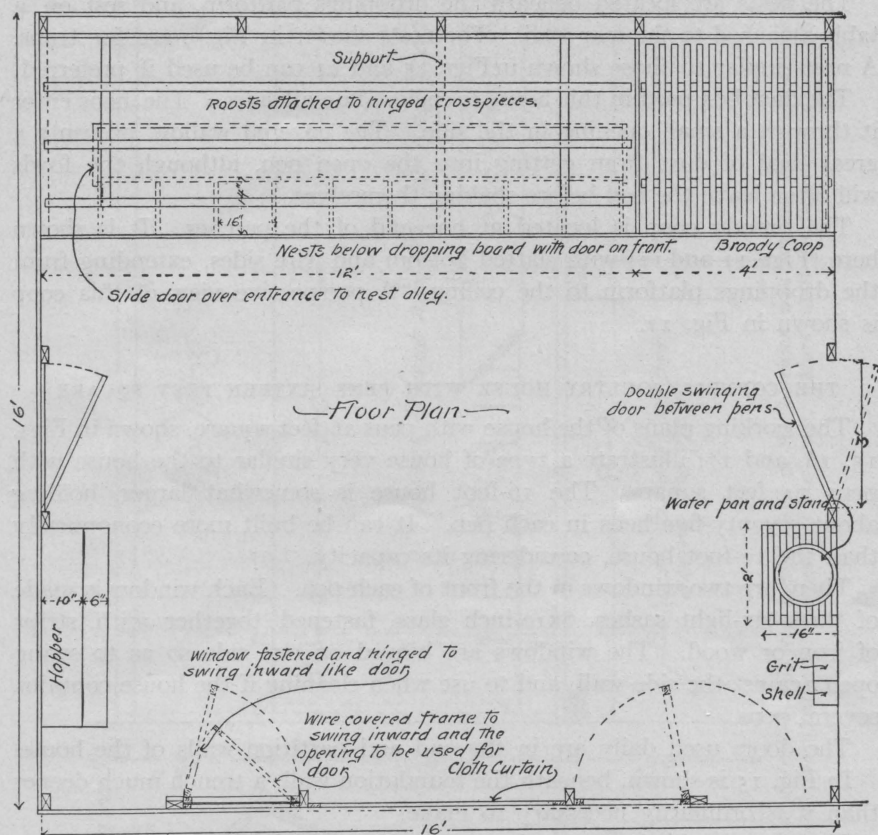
Floor plan and interior arrangement of the Cornell poultry house with pens 16 feet square
